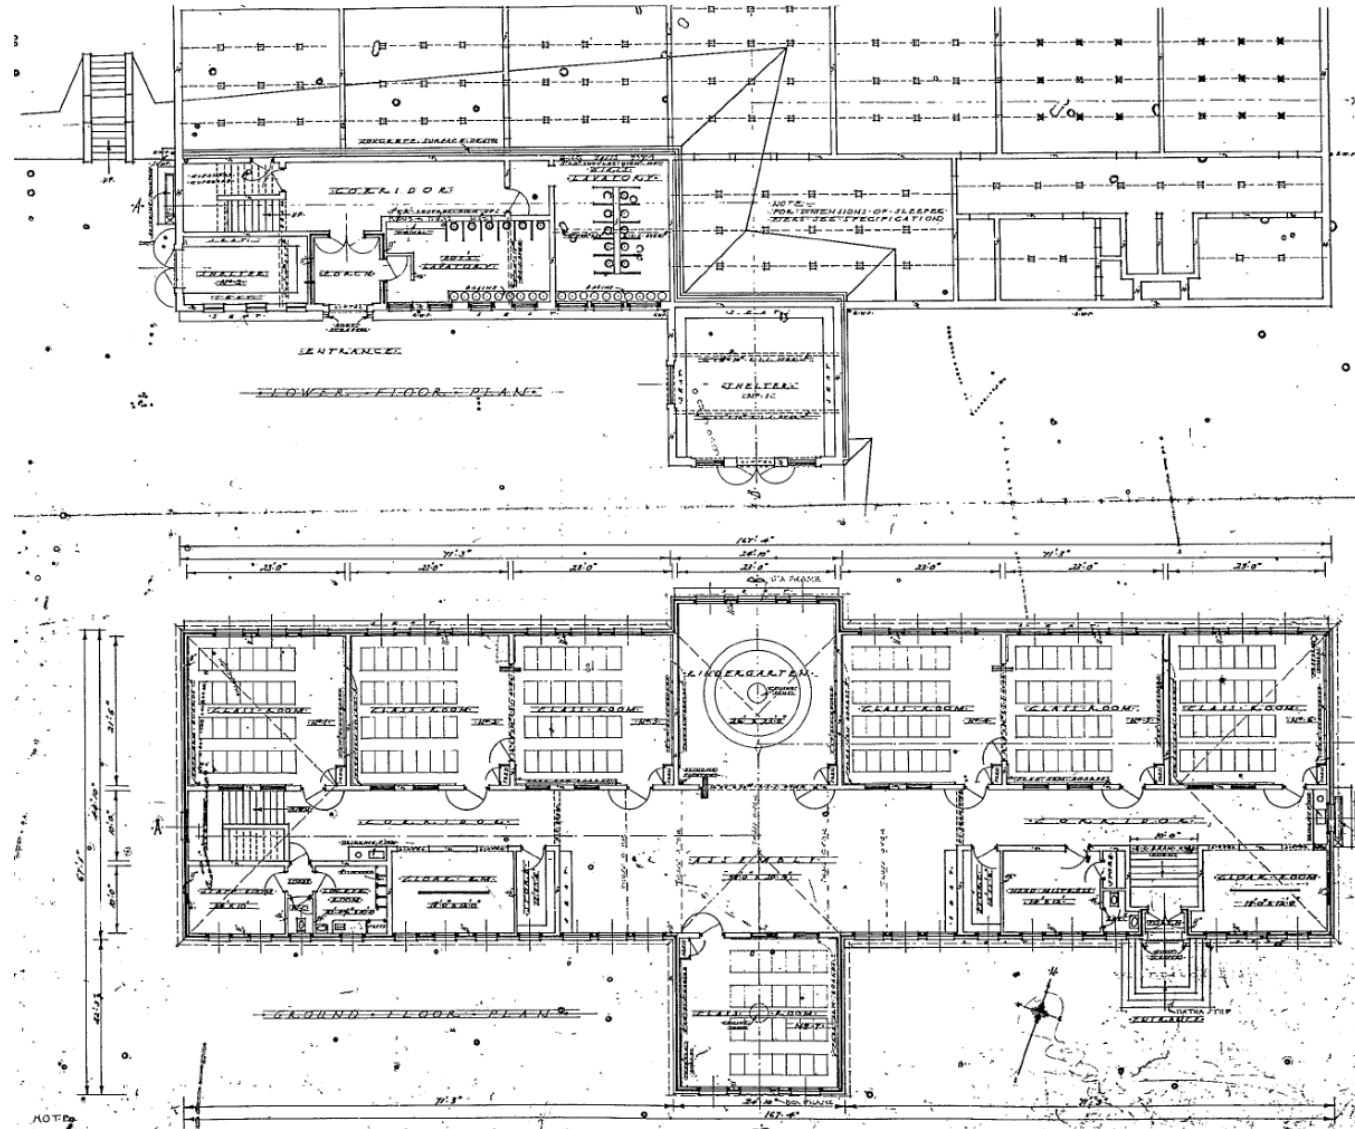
1930 Original Floor Plan of the Infants School (McHatton) building. Source: NSW Government Architect plans, copy held by NSPS
